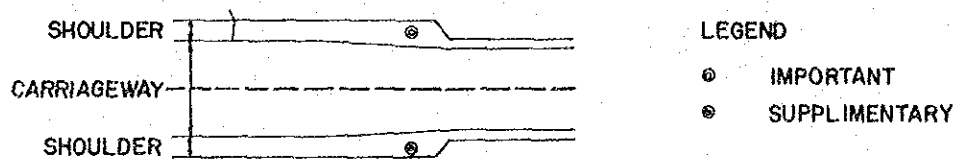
Typical Luminaire Arrangement (Width Transition)
